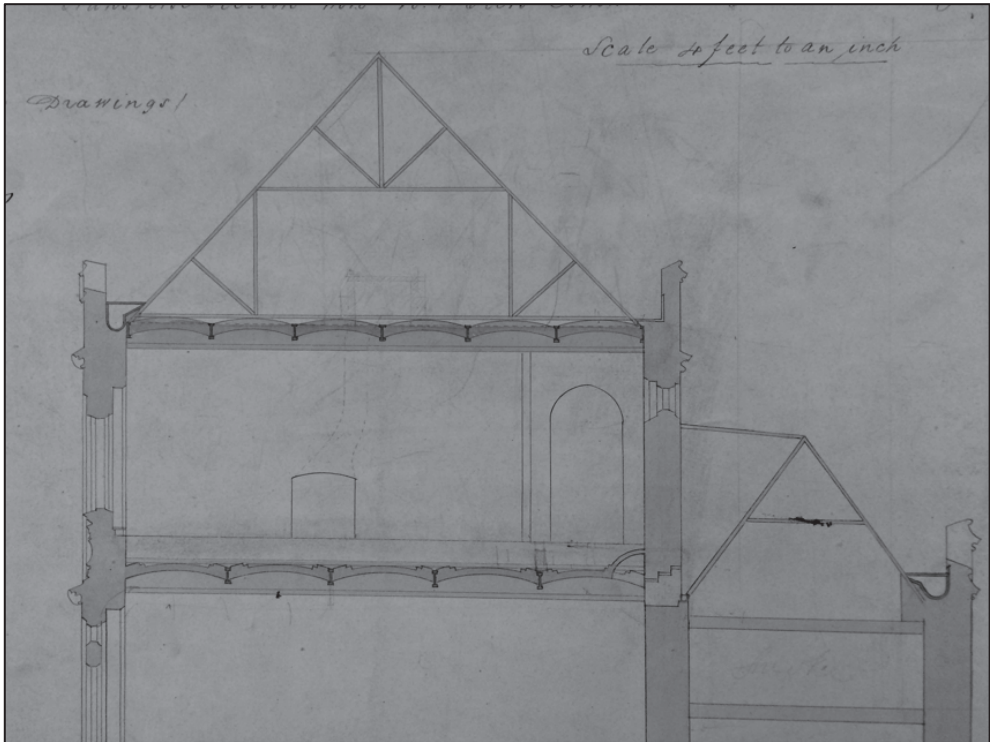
Cross-section, 1841, showing jack-arches in roof space and between floors (Source: National Archives: Work 29/2833).
